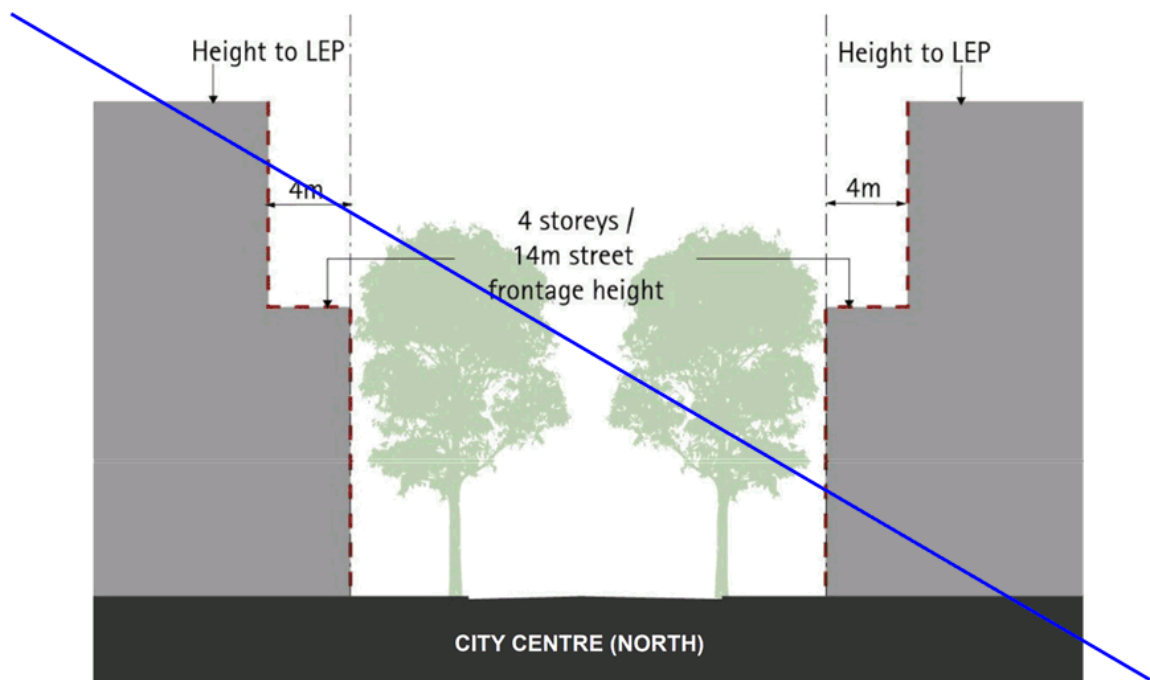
B.1.4 – Street Frontage Heights and Upper Level Setbacks City Centre (North)
